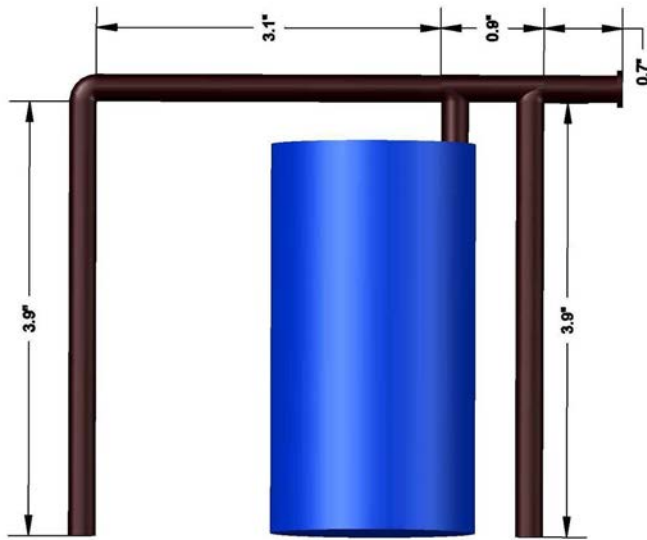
This Auto CAD drawing represents the secondary storage used in the system, dimensions shown in feet.
